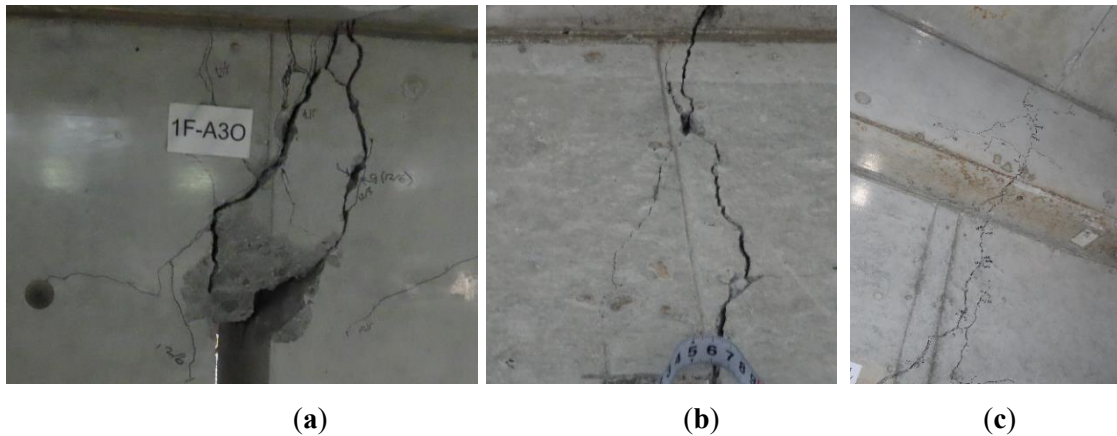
Damage at hanging walls under 150% of the designed waves: (a) first floor; (b) second floor; (c) third floor
